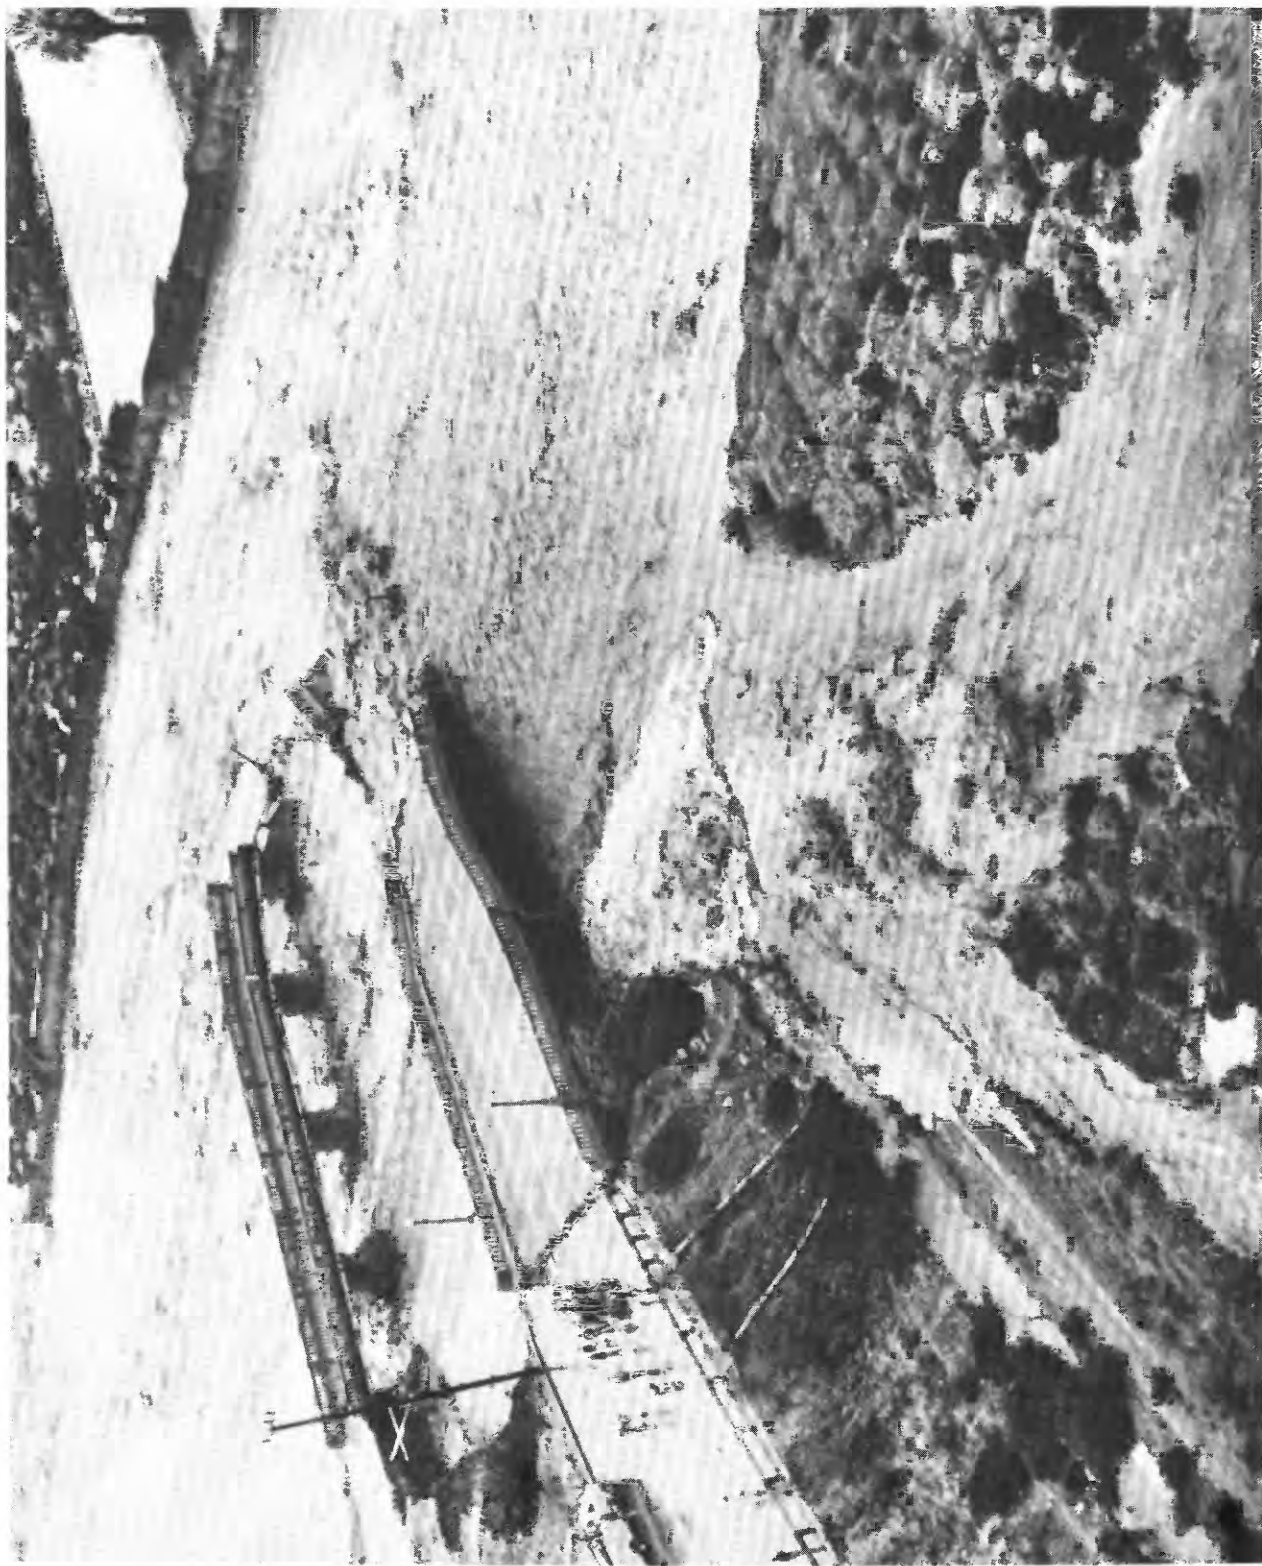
South channel of Tujunga Wash showing destruction of the south-channel Foothill Boulevard bridge, upstream on the right, and the smaller Wentworth Place bridge. The left end of section K-K' is the embankment supporting the Foothill Boulevard bridge abutment, left of center. Photograph by Harold Morby.
